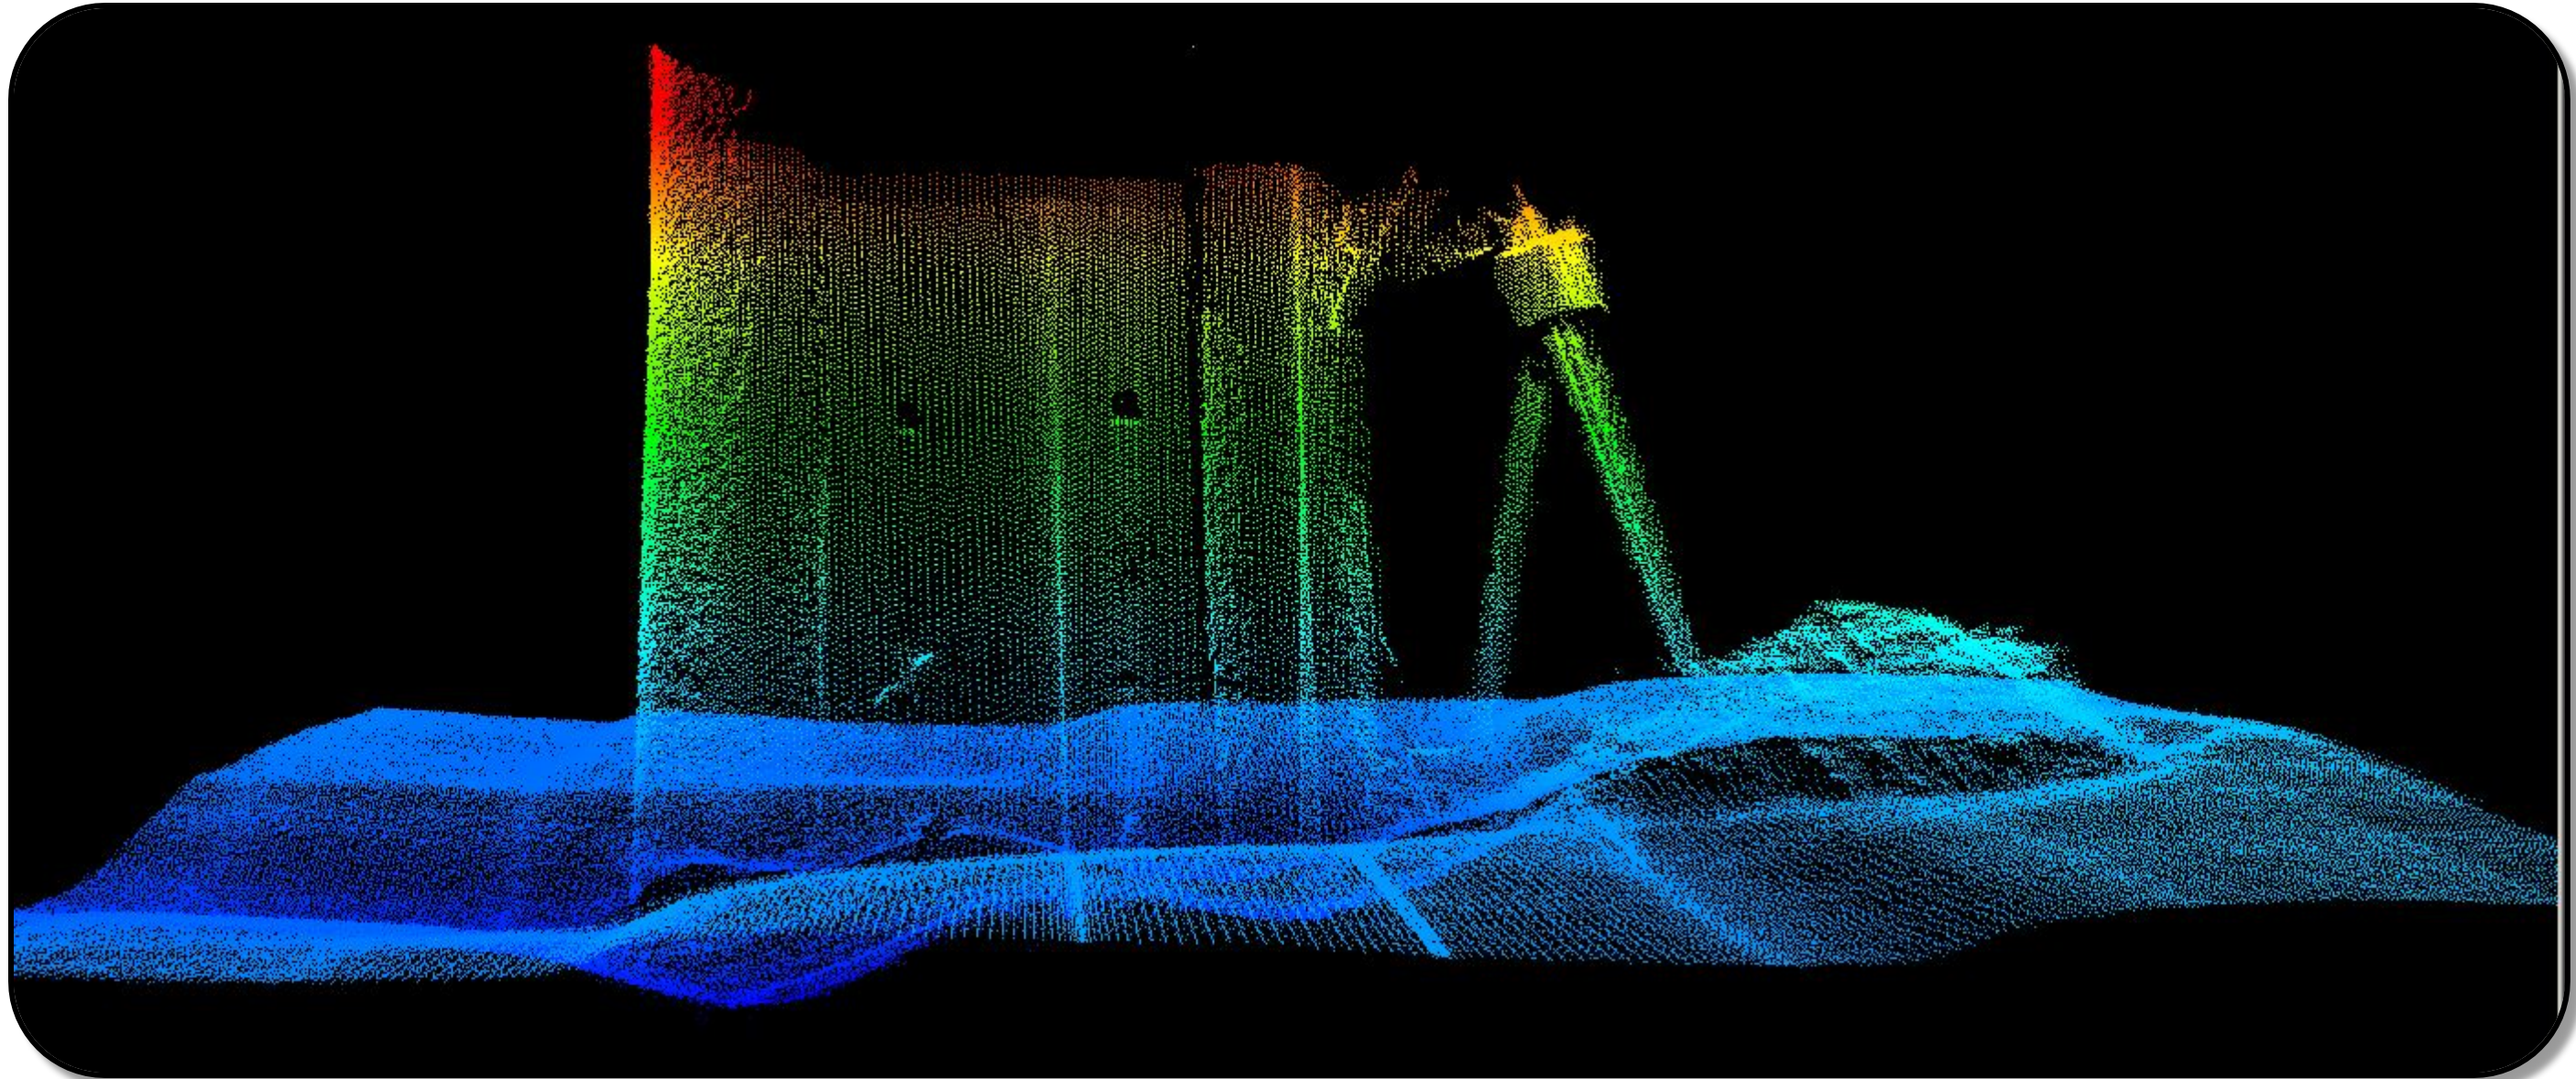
Example point cloud image of Pier 10 from the south. Visible in the image is the undulating river bottom elevation surrounding the bridge pier, the concrete bridge pier, and angled piles and a pile cap to the right side of the image.
